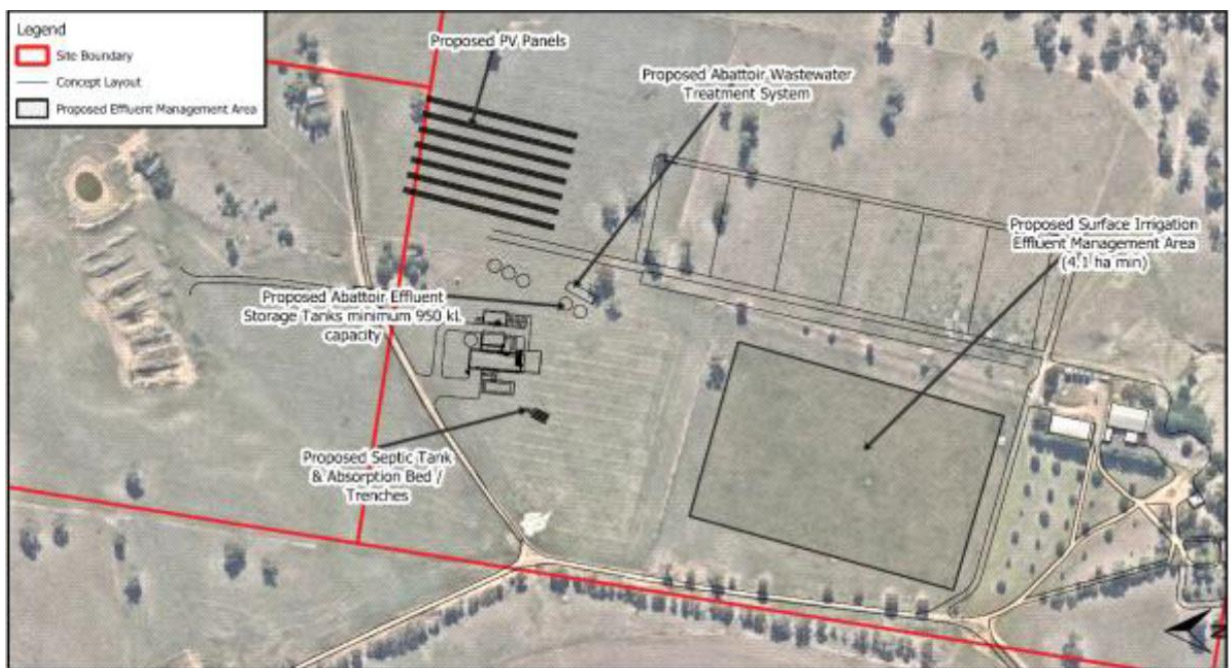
Proposed Onsite Wastewater Management System (Source: Martens, 2024)
